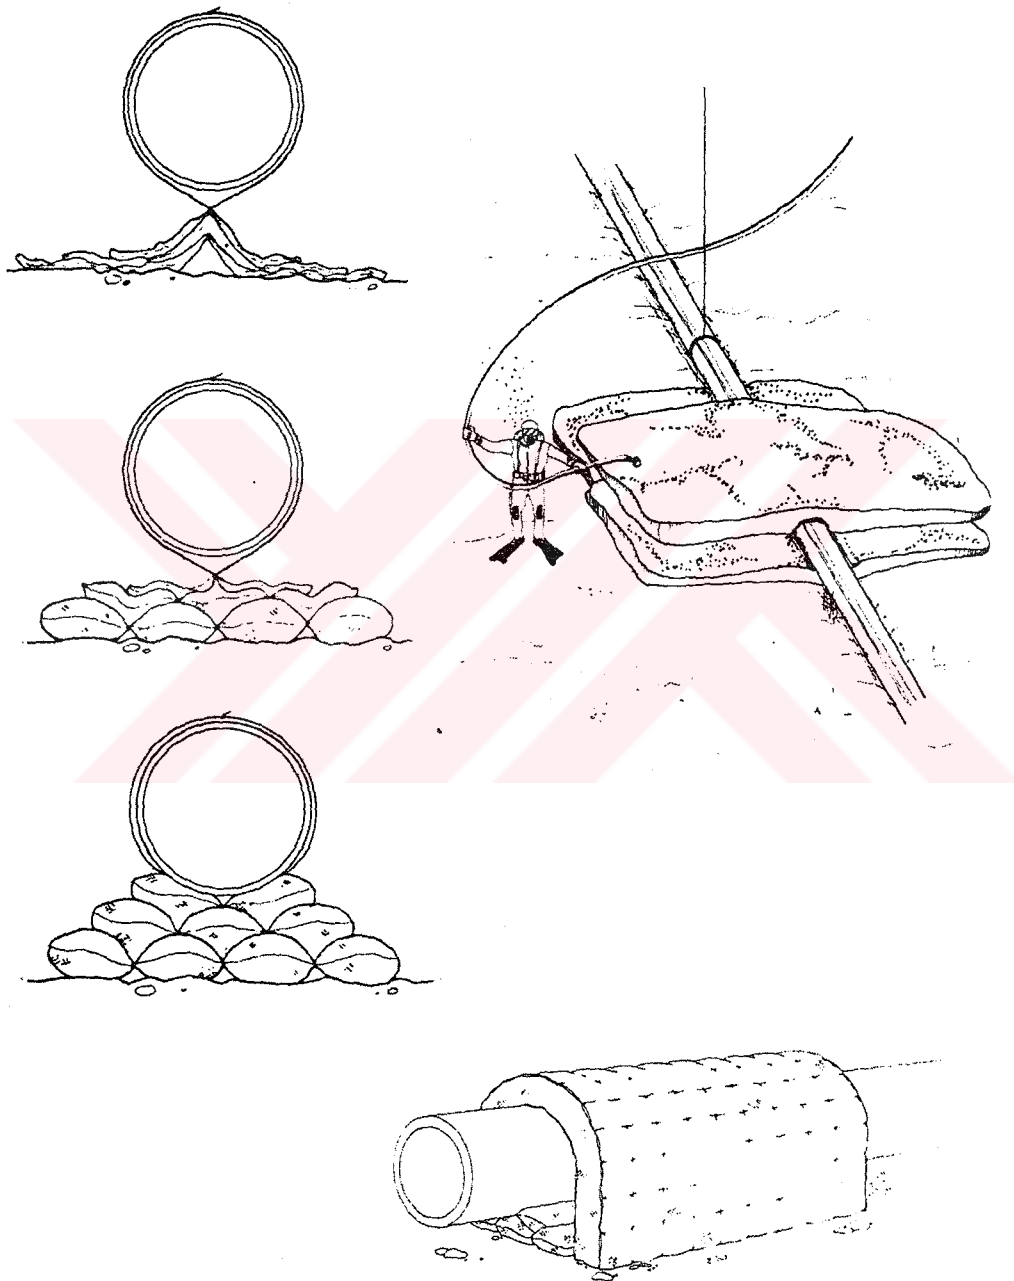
Grouting (support) [Melegari&Bressan (1990)]
